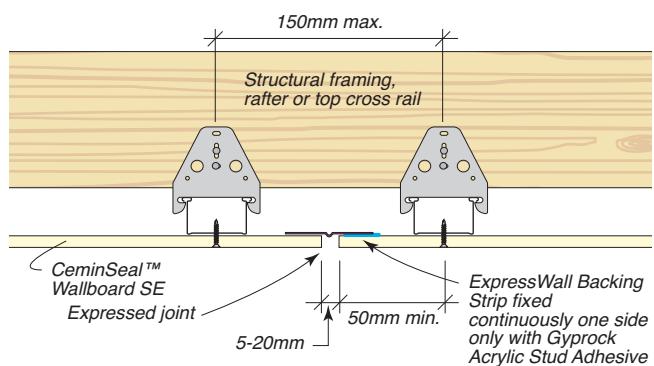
Framing and Sheet Module Control Joint – Expressed Joint – Alternative
